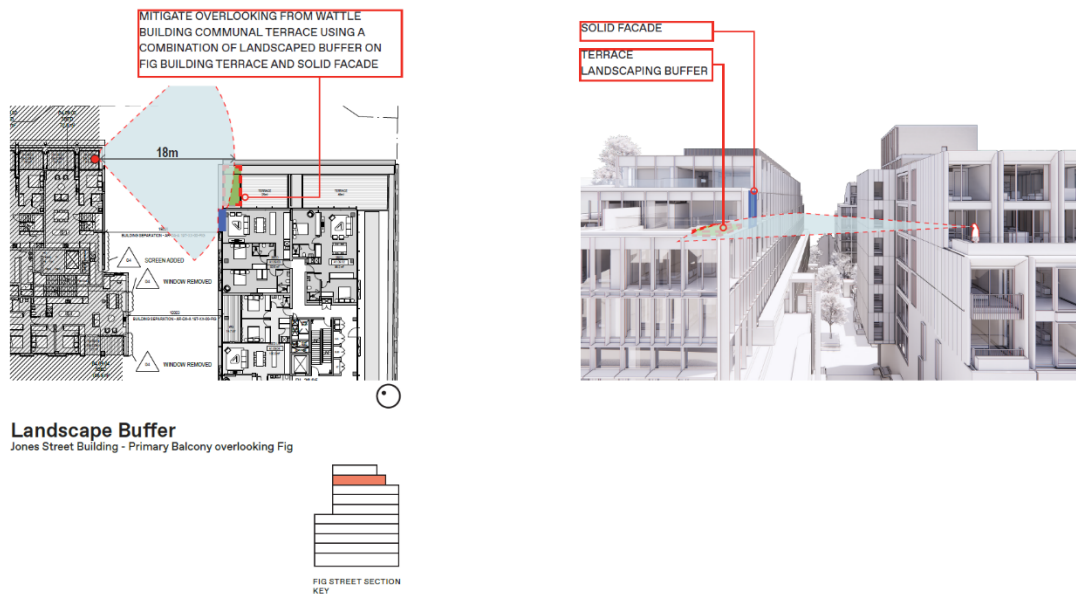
Privacy protection measures - Non-accessible planter and solid facade: Fig Street Building to Jones Street Building
